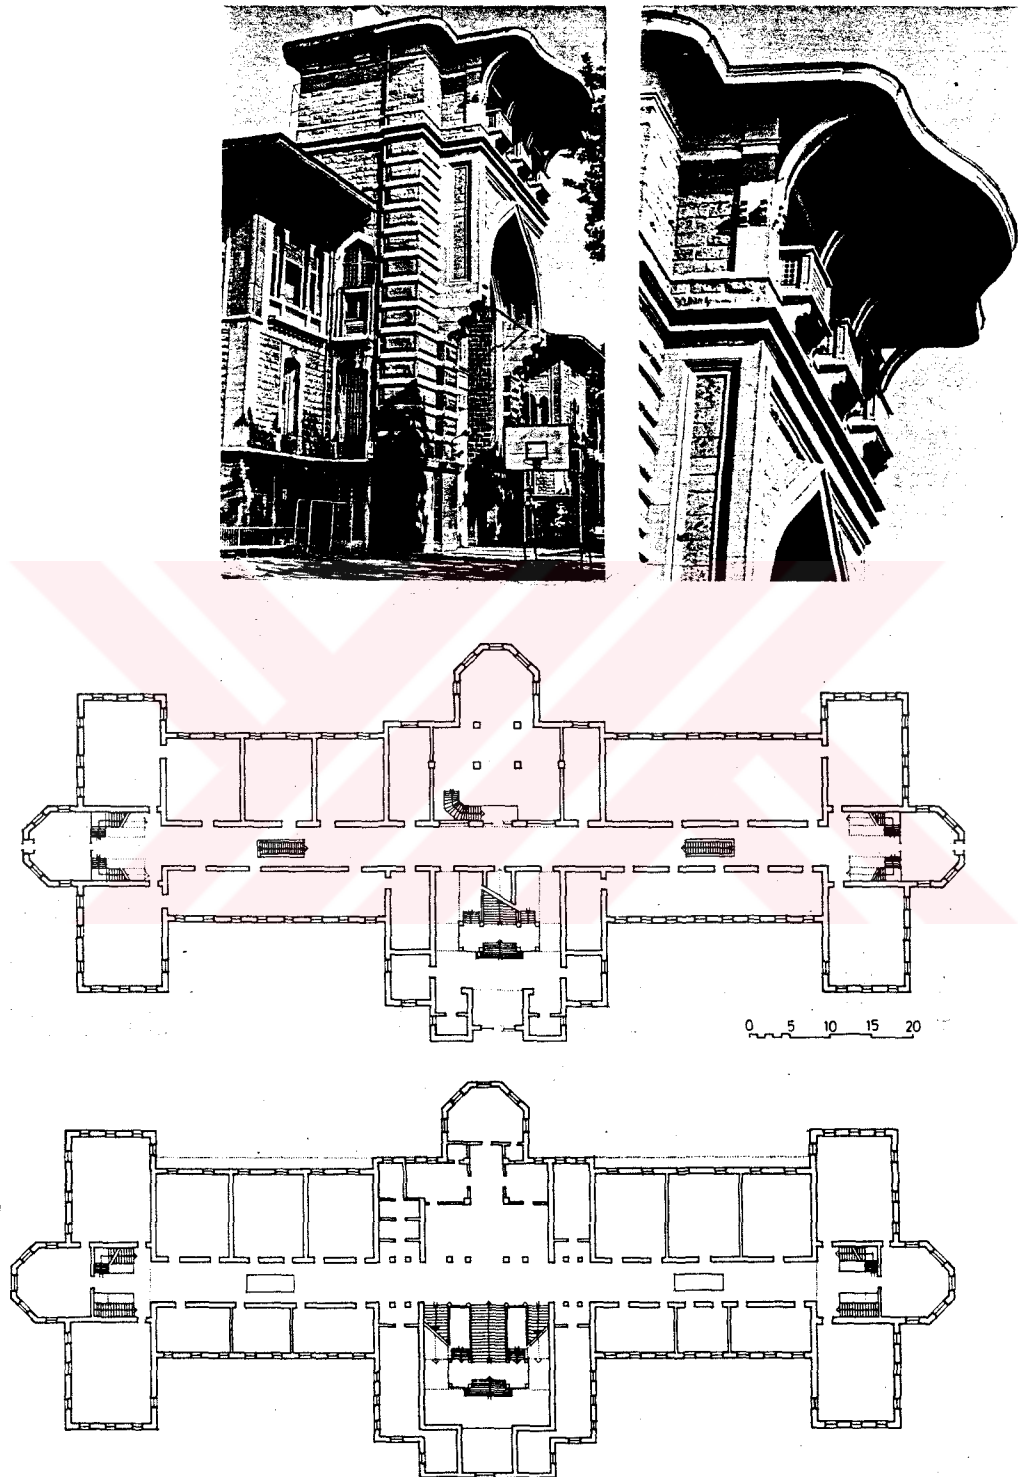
Public Debt. Administration Buildings. Plans and Facade, 1899, by Vallauri.
